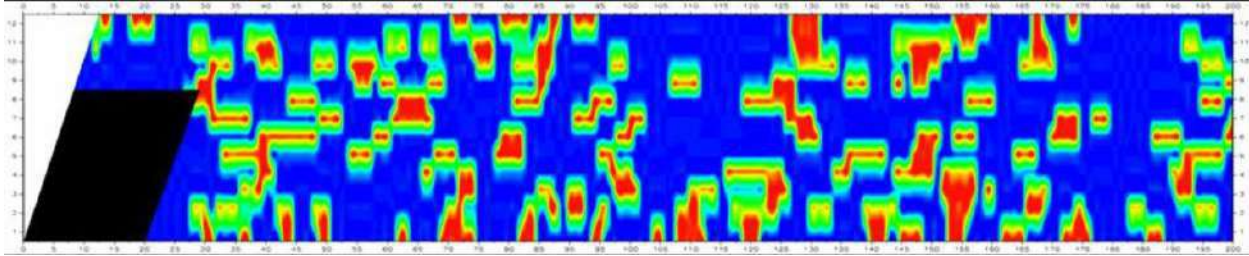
Detection of voids or delaminations on Centerway Bridge deck (Logan 2104).
